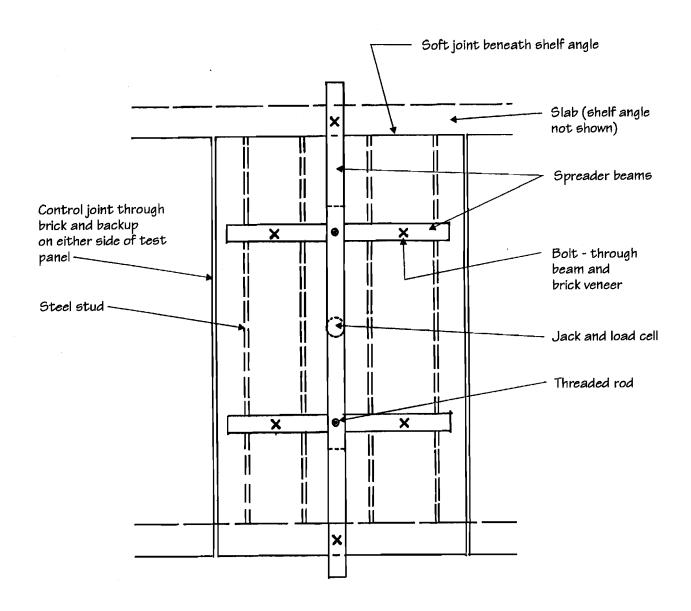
2 ELEVATION - FULL SCALE IN-SITU TEST APPARATUS (See aslo Fig. 4 - 1)
